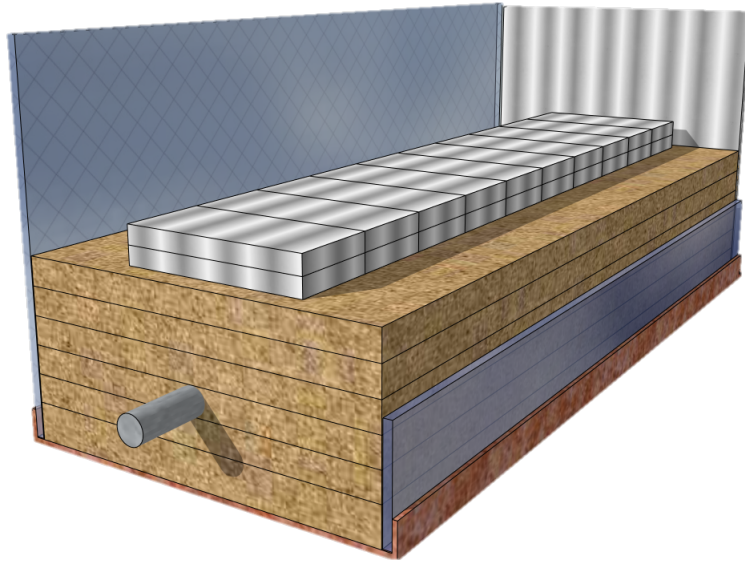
Layered construction of test specimens indicating two foundation layers, four soil layers, steel pipe and surcharge plates
